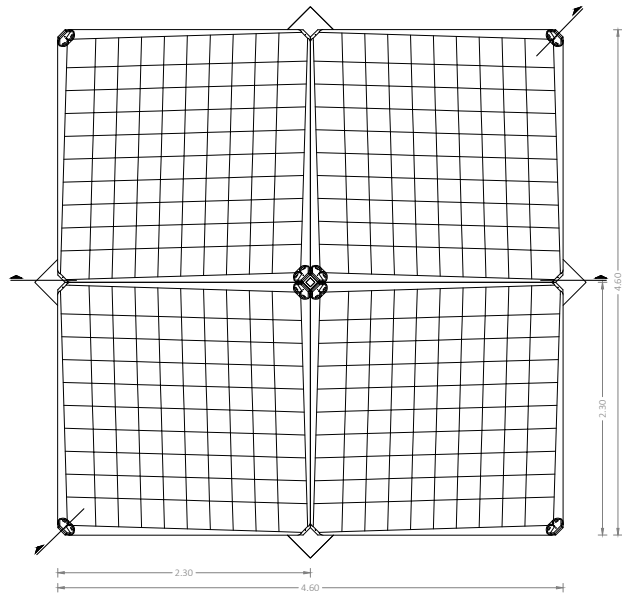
Plan view dimensions of the Wing Shelter
